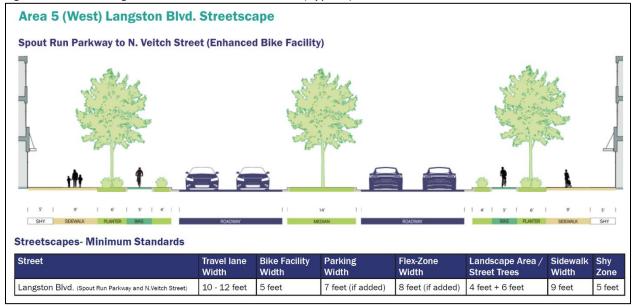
LBAP Langston Boulevard Cross-Section (Typical)
